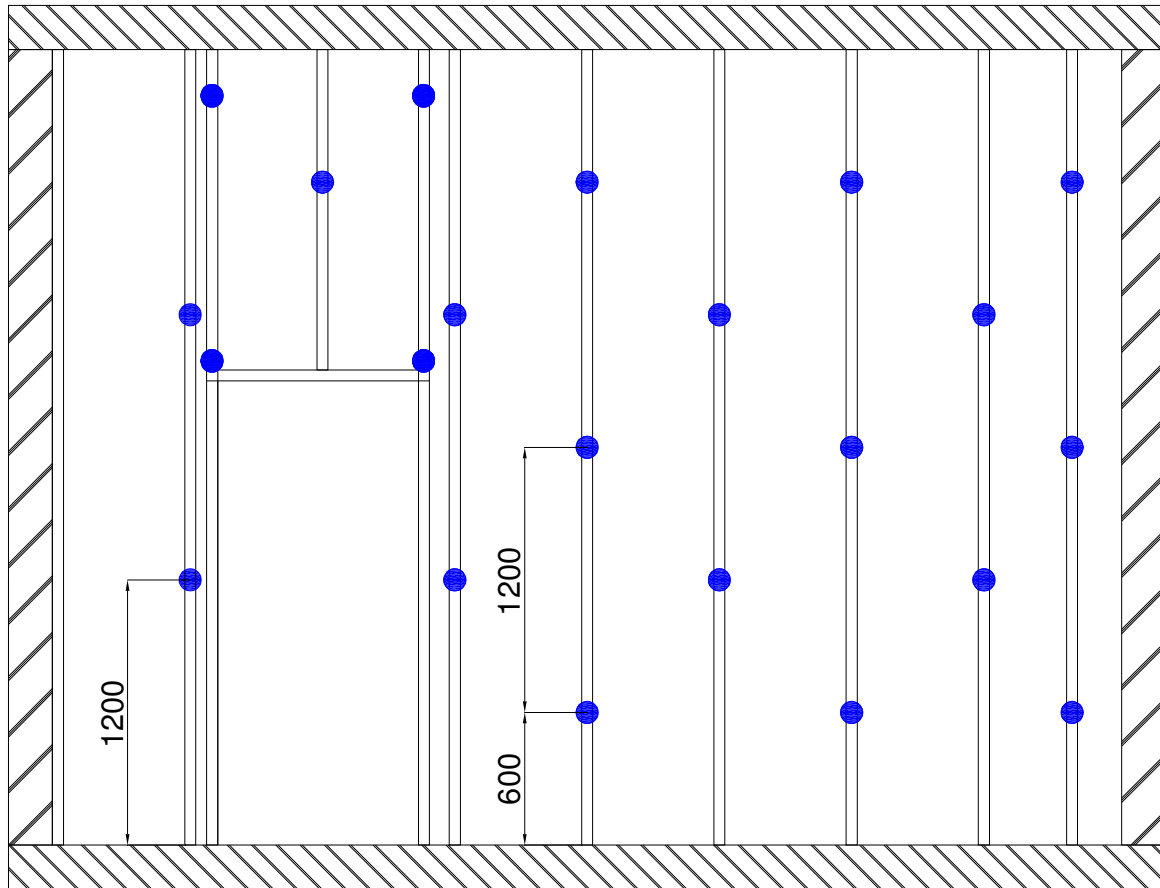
Gypframe 99FC50 Fixing Channel cross brace layout for twin frame partition.
